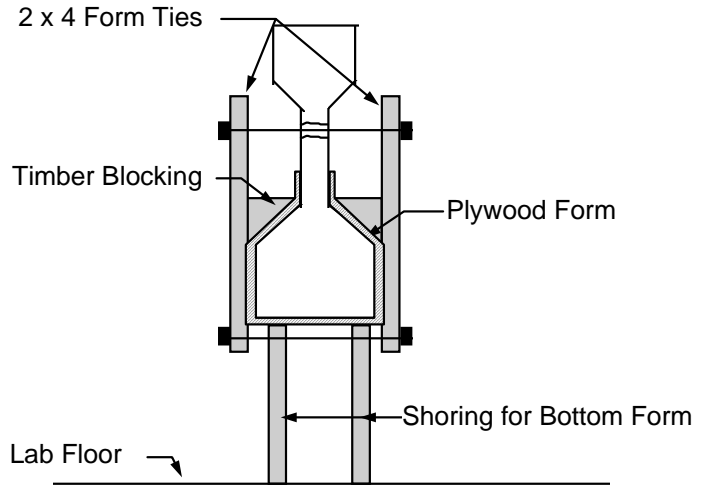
5 Schematic of formwork for cast-in-place concrete repairs of Steek girder
